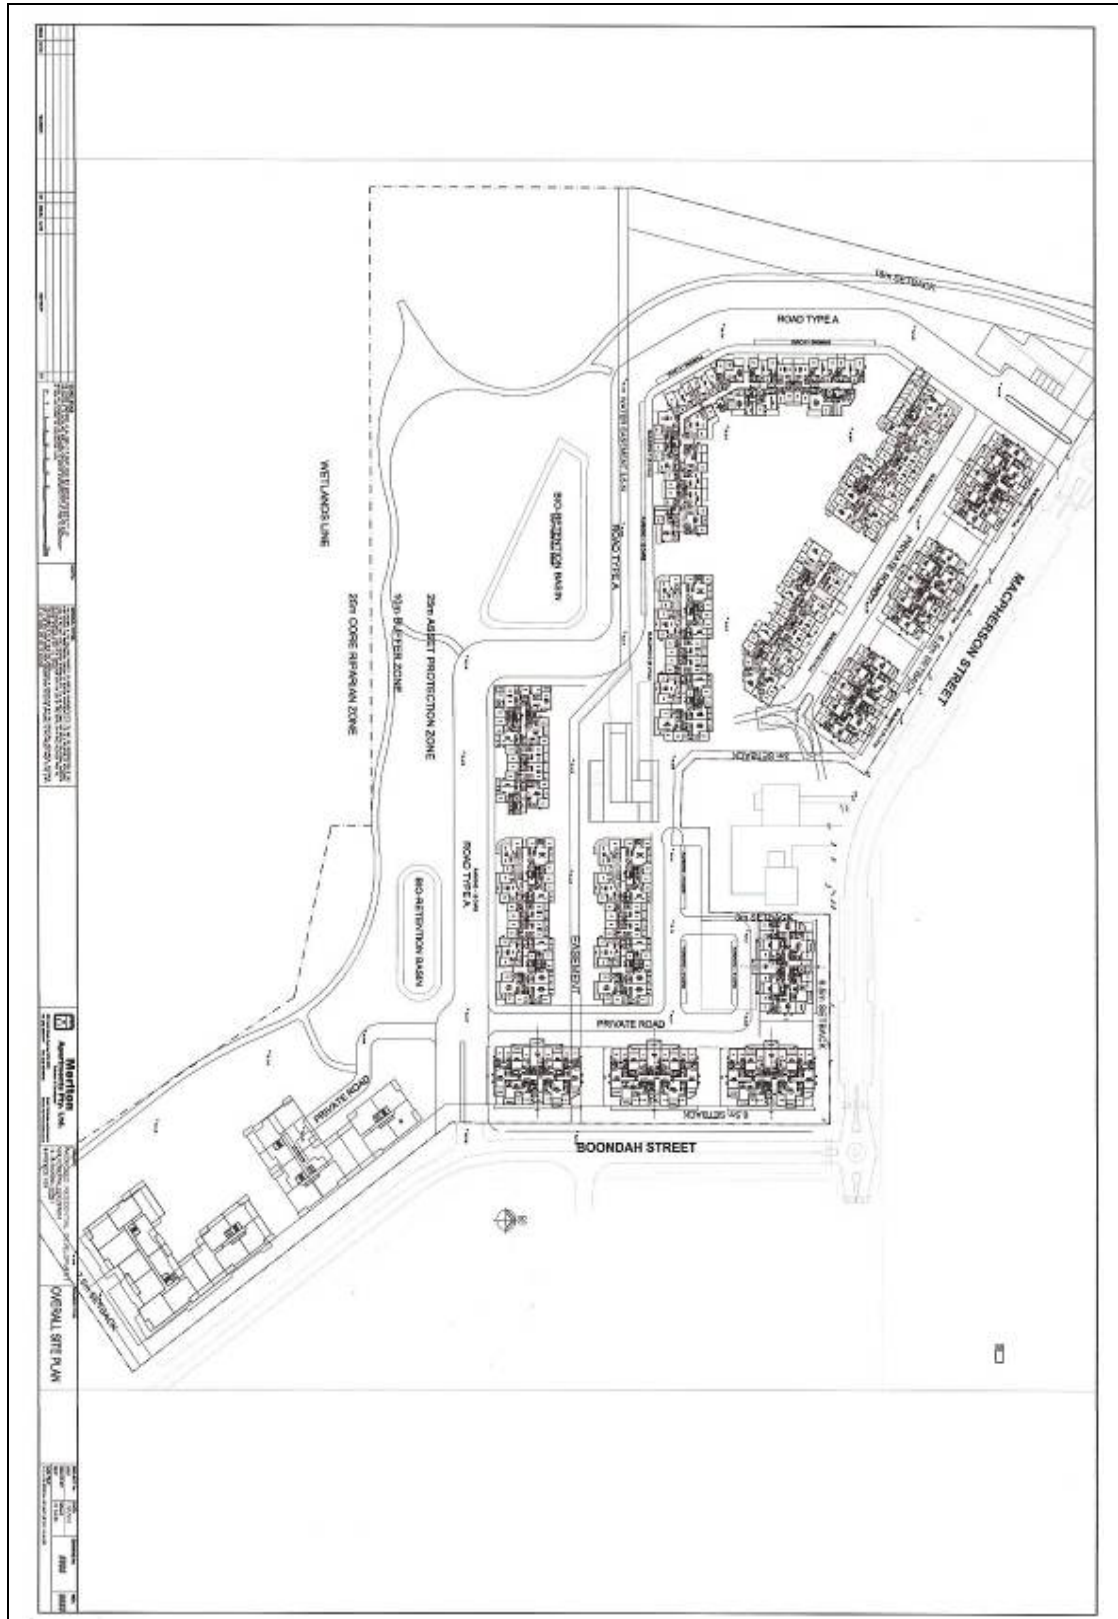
The Current 14 to 18 Boondah Road and Macpherson Street Site Development Concept Design (Source: Meriton Pty Ltd).
